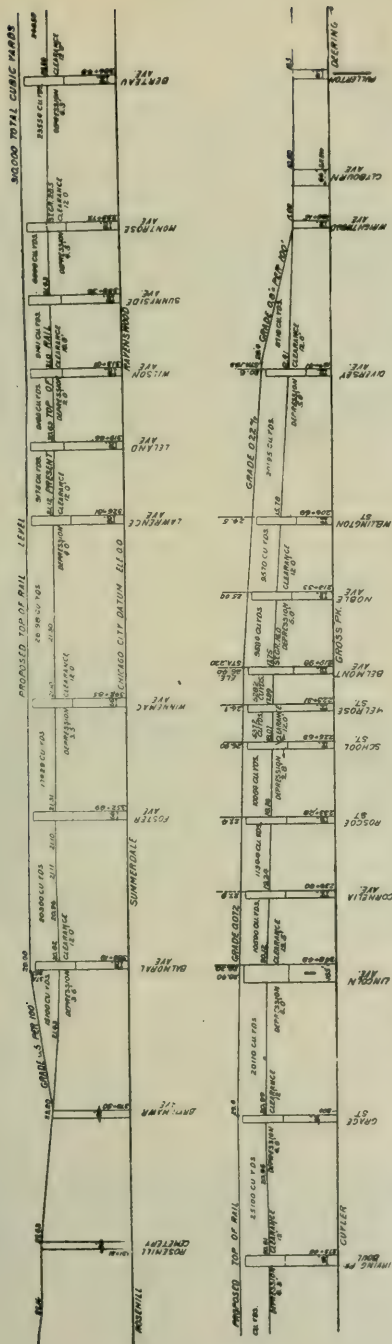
PROFILE OF THE MILWAUKEE DIVISION ELEVATION, FROM DIVERSEY BOULEVARD TO ROSE HILL.
